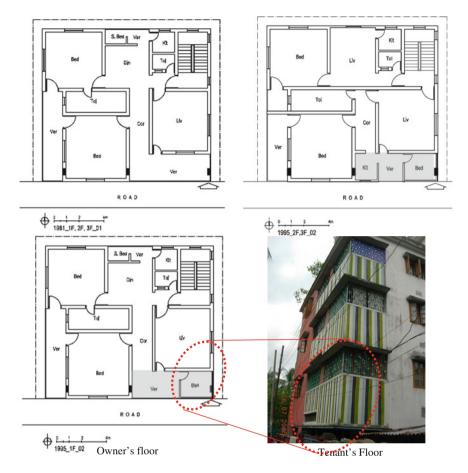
Examples of balcony transforming. The 2 m wide balcony at each floor was later transformed according to necessity. For the owner's floor, it was an extra bedroom, while at the tenant's floor, a kitchen was also provided as one unit became two units (*shaded*). *Source* Author
